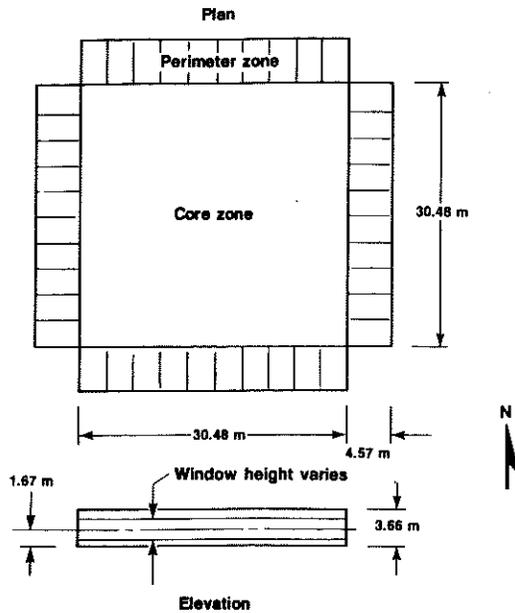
Plan of simulated office building showing alternative window-to-wall ratios. Module consists of a 929 m² core surrounded by 4.57m deep perimeter zones, each divided into 10 modules 3.05 m wide.
